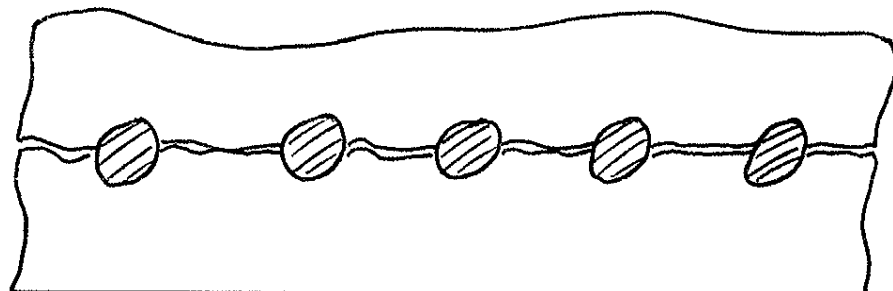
Delamination of cover in concrete with close-spaced reinforcement
